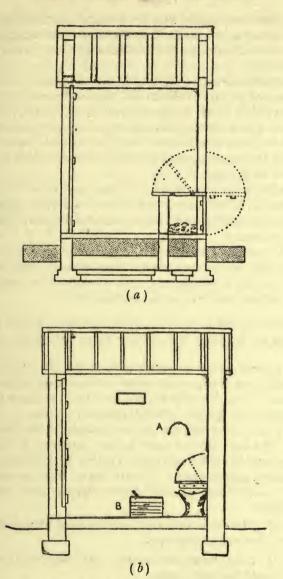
Plan of simple type of earth closet. A = carrying handle for pail. (Hung up when not in use.) B = Box of earth.
